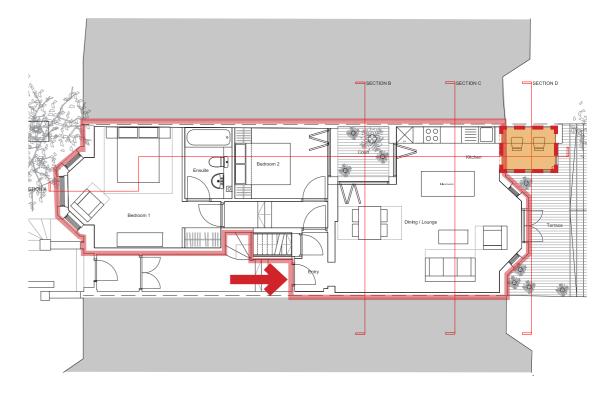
GA Plan of proposal highlighting entry point and extension to the rear
